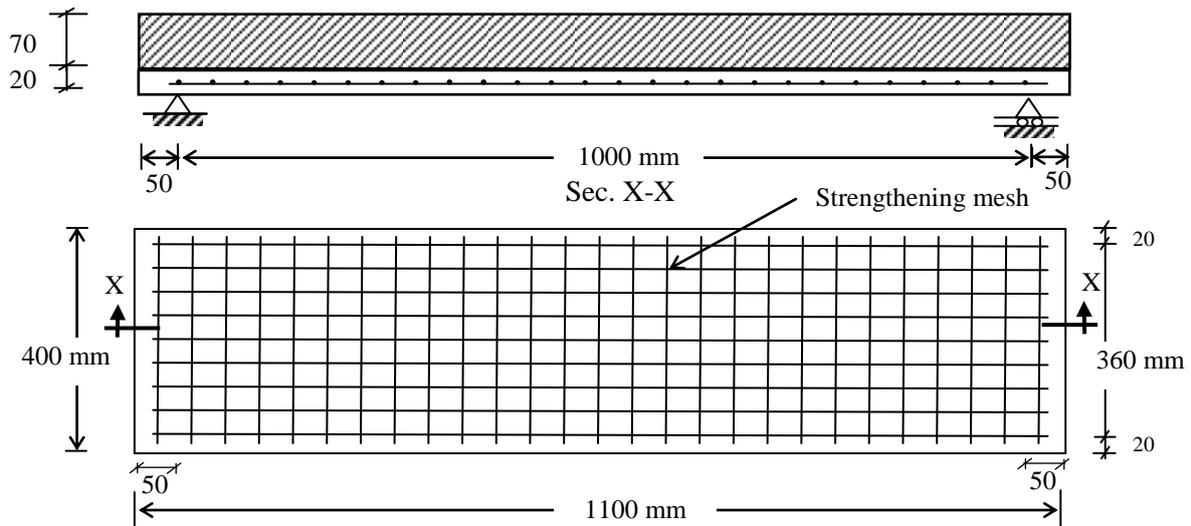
Details of strengthening for specimens SSM, SG and SC
